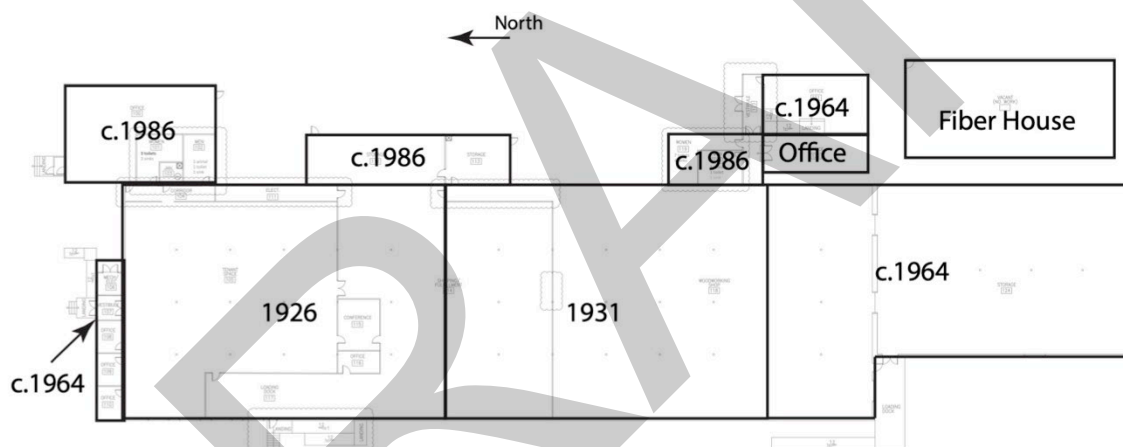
Somerset Mill Floor Plan Chronology (created from 2021 floor plans drafted by The Wooten Company for Stokes Manufacturing)
